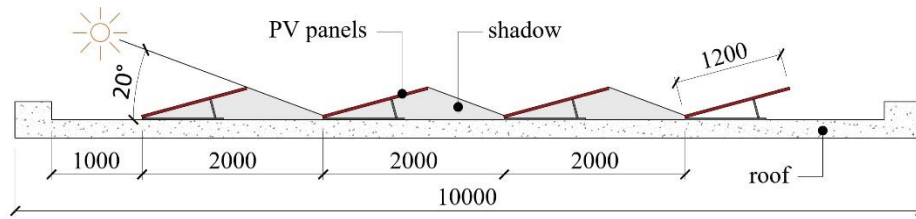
Section drawing of PV panels installation and shading on December 21 at 12:00 in Riga
